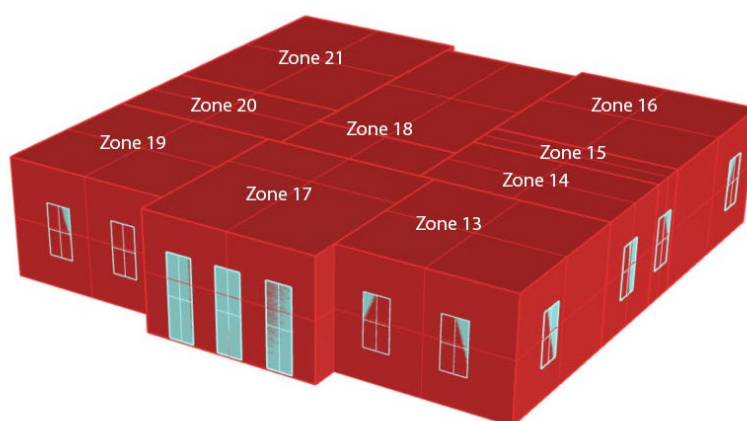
Zones of House of Dr. Stoyan Chomakov – first floor
